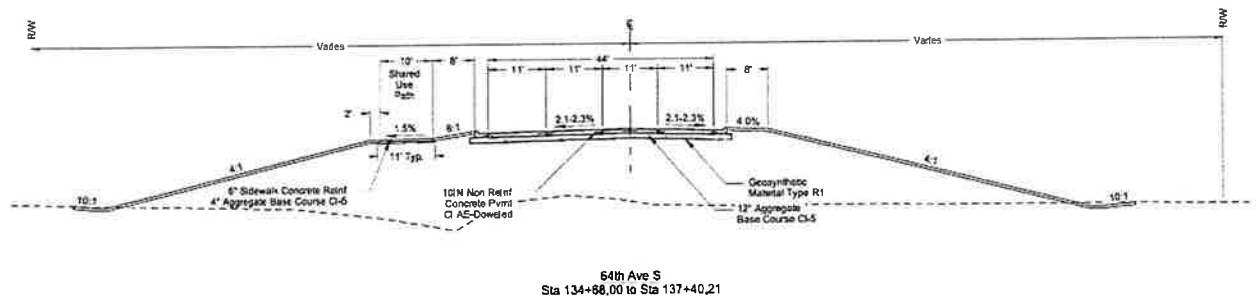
64th Avenue S, East of Bridge, Existing Typical Section
